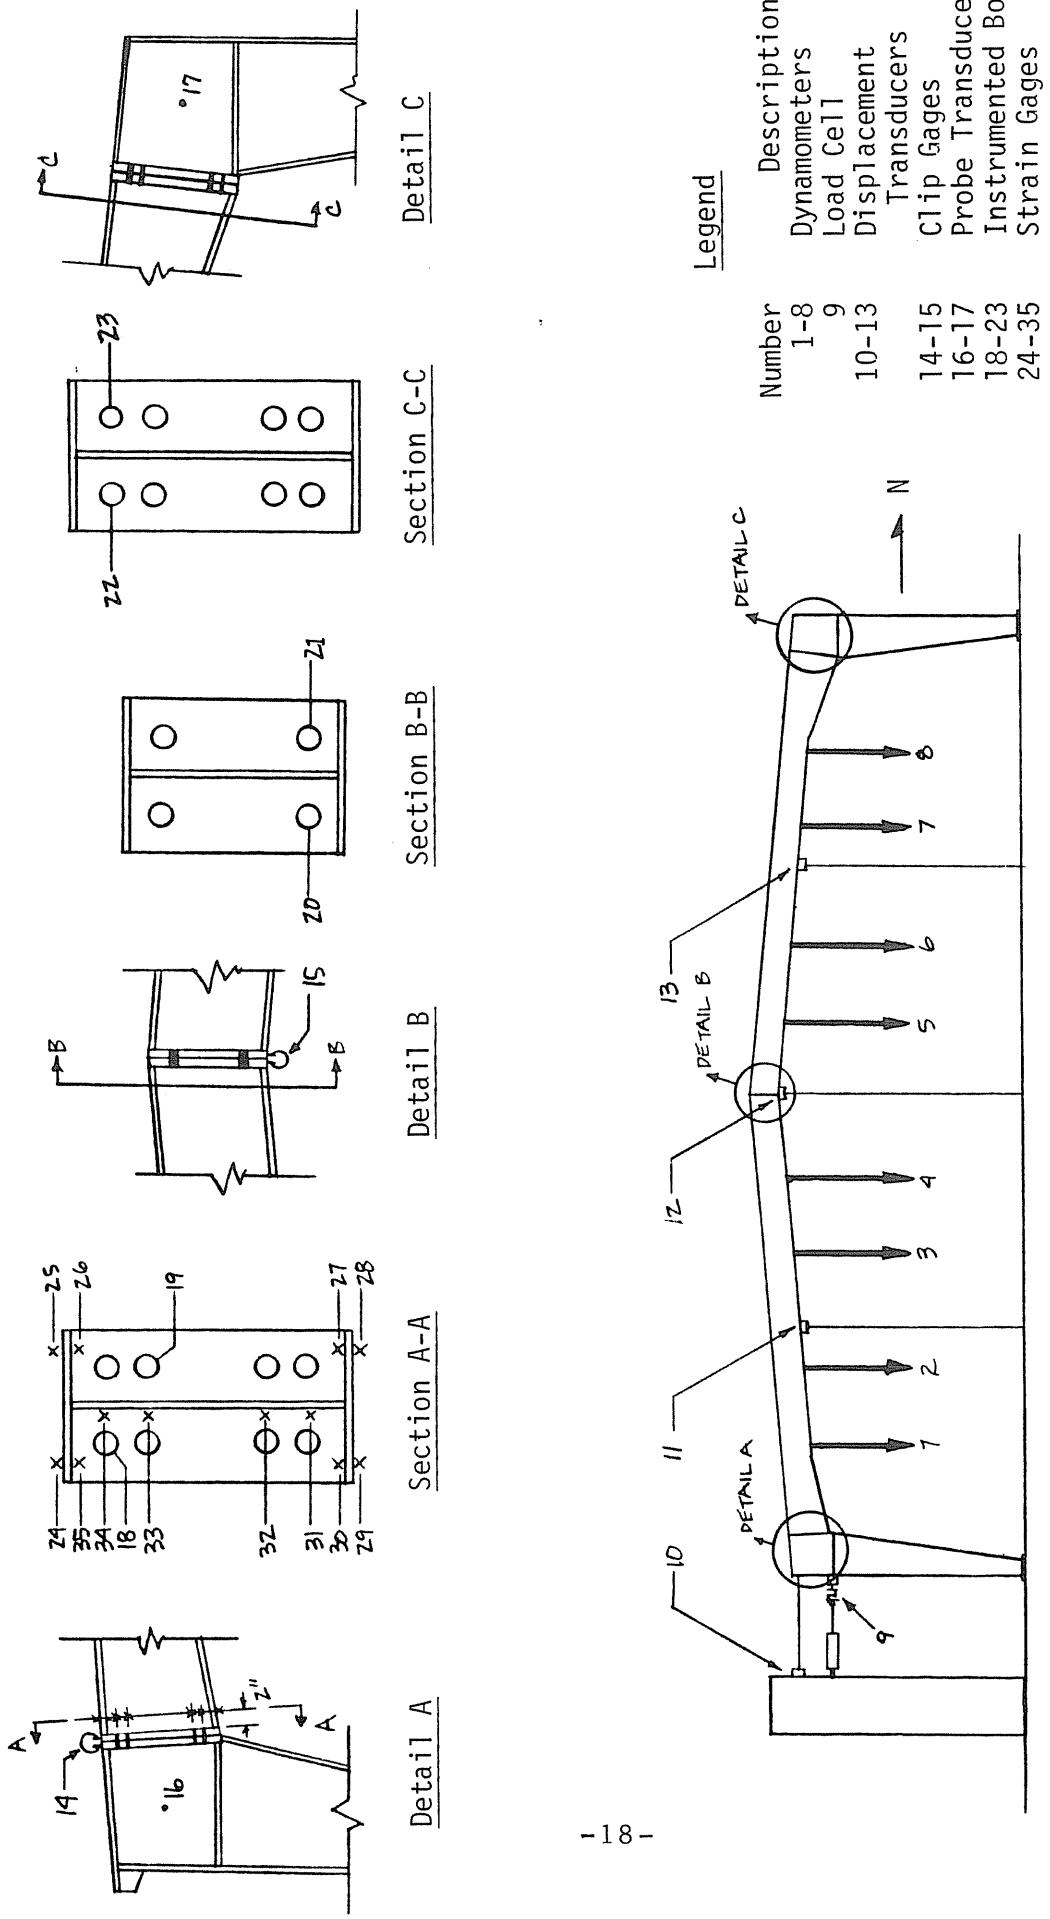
VIEW OF WEST FRAME INSTRUMENTATION
